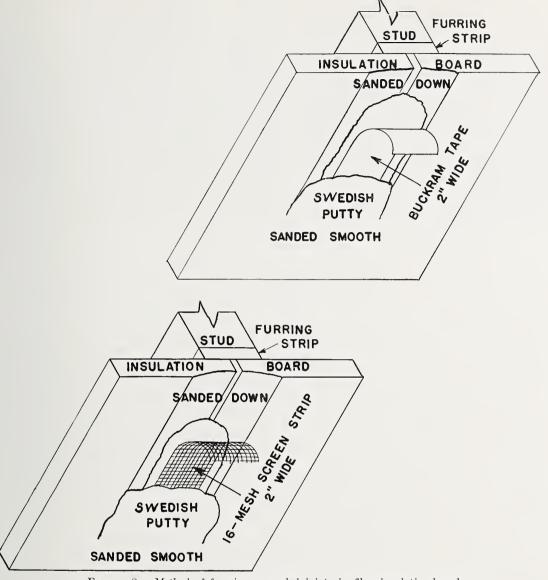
Method of forming concealed joints in fiber insulation boards.
